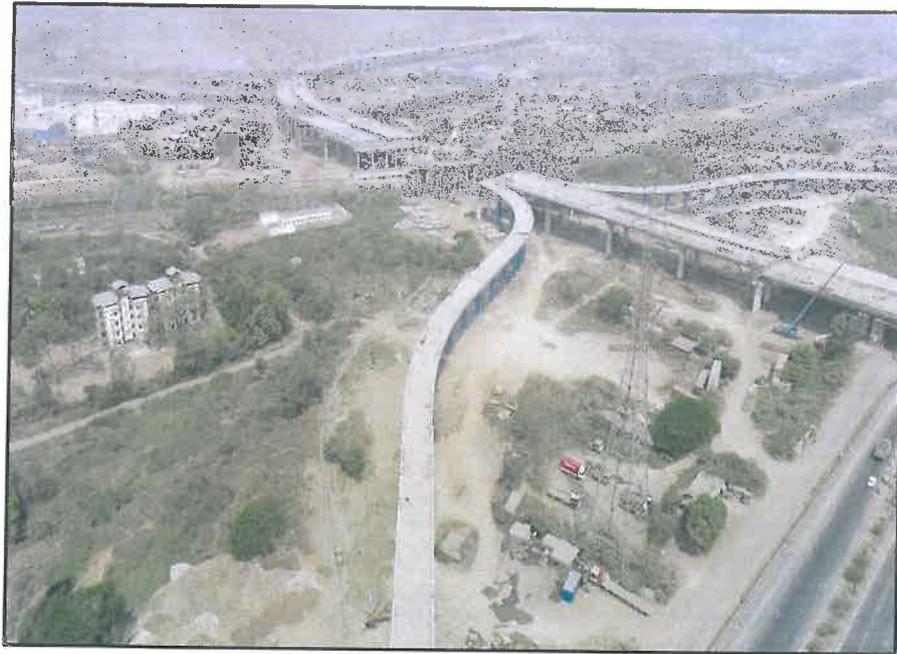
JMP and MPP ramp at Chirle Interchange.
